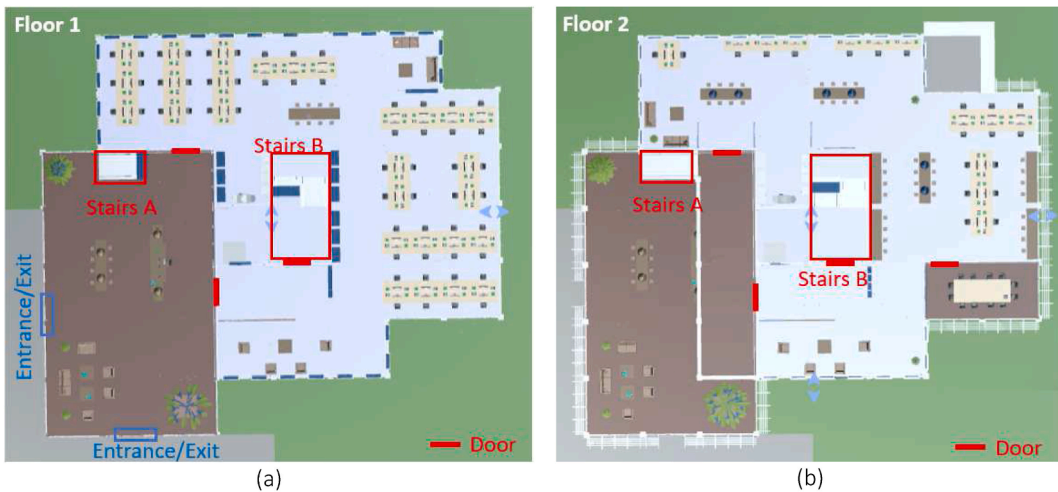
Top view of (a) Floor 1 and (b) Floor 2.
